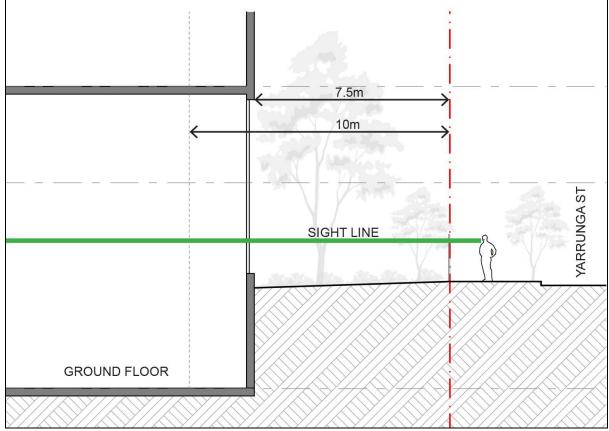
28 Yarrunga St sectional diagram showing relationship to existing street level.
